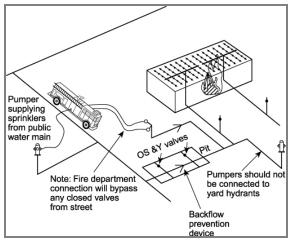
(b) Water Supply to the Fire Department Connection.
